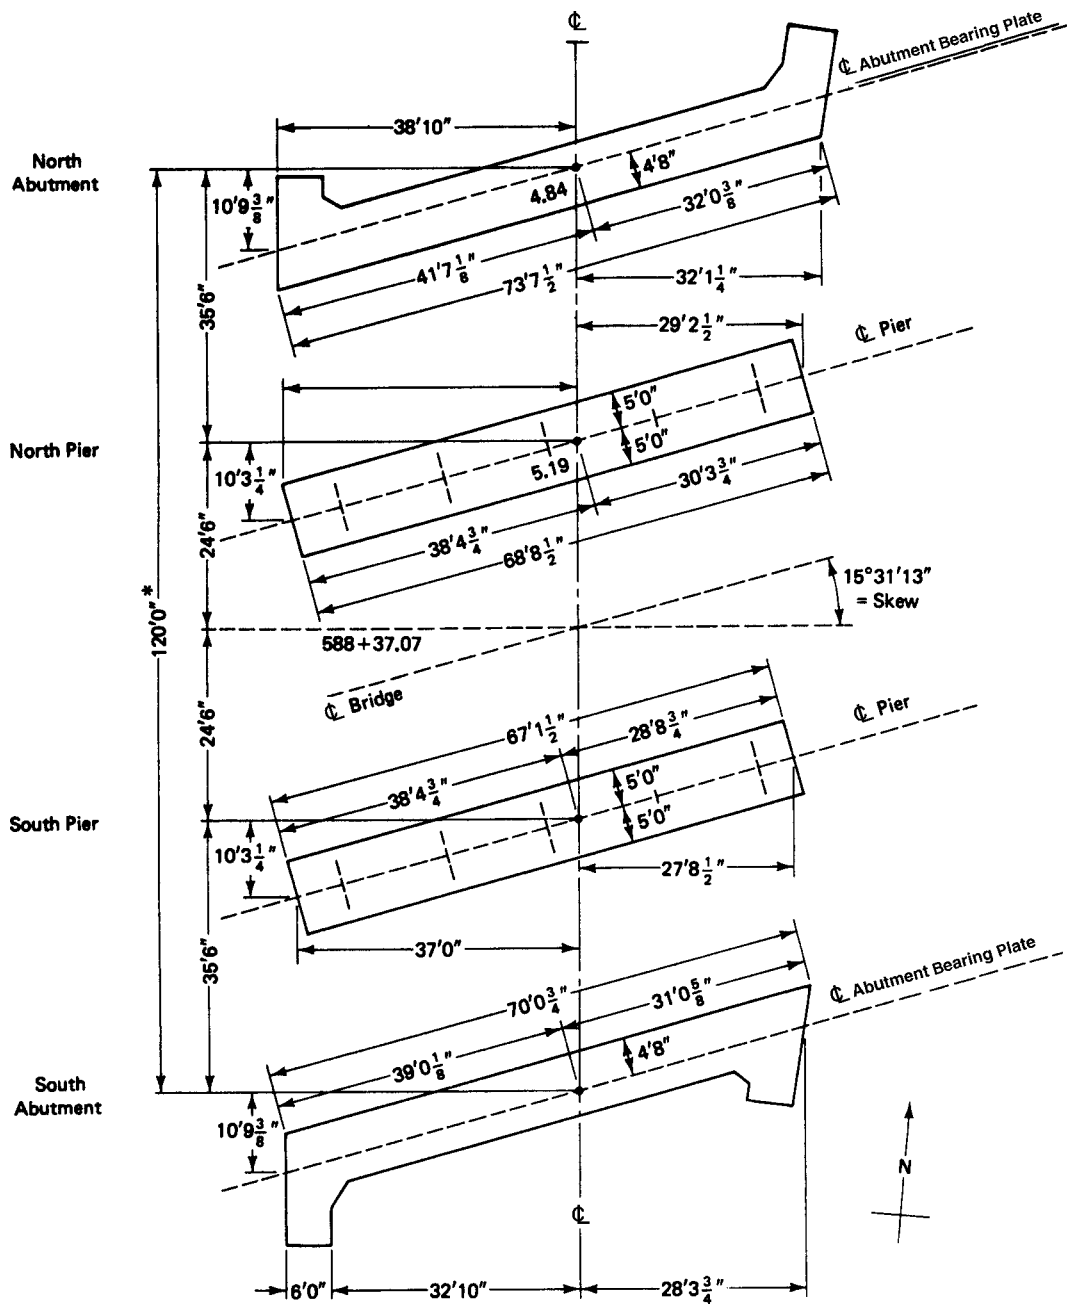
Foundation layout sketch. *See same dimension on Figures 15.8 and 15.9.
